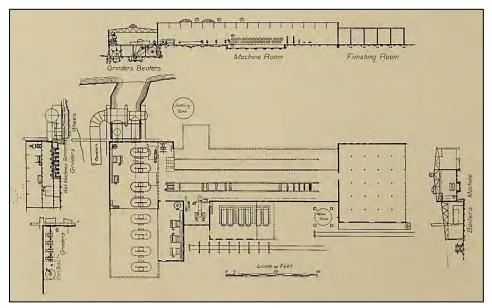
Floor plan of paper mill in 1909 with sections along the margins (pairs of stacks and water tower at bottom center provide orientation to above photograph)
